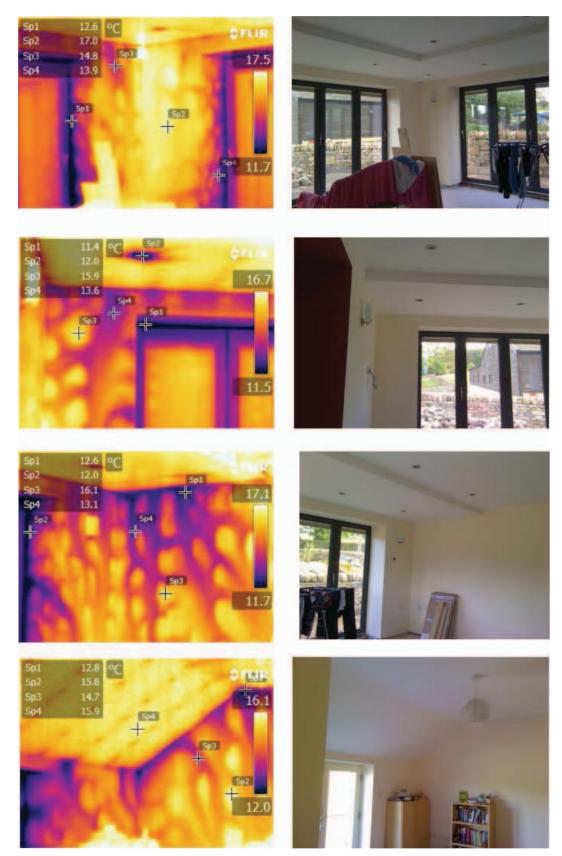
White House Farm, Stirton, Skipton - Addition to dwelling. Top D North east corner of addition, middle D north wall and east wall, including section which protrudes, bottom D north east corner on bedroom on first floor of addition.
